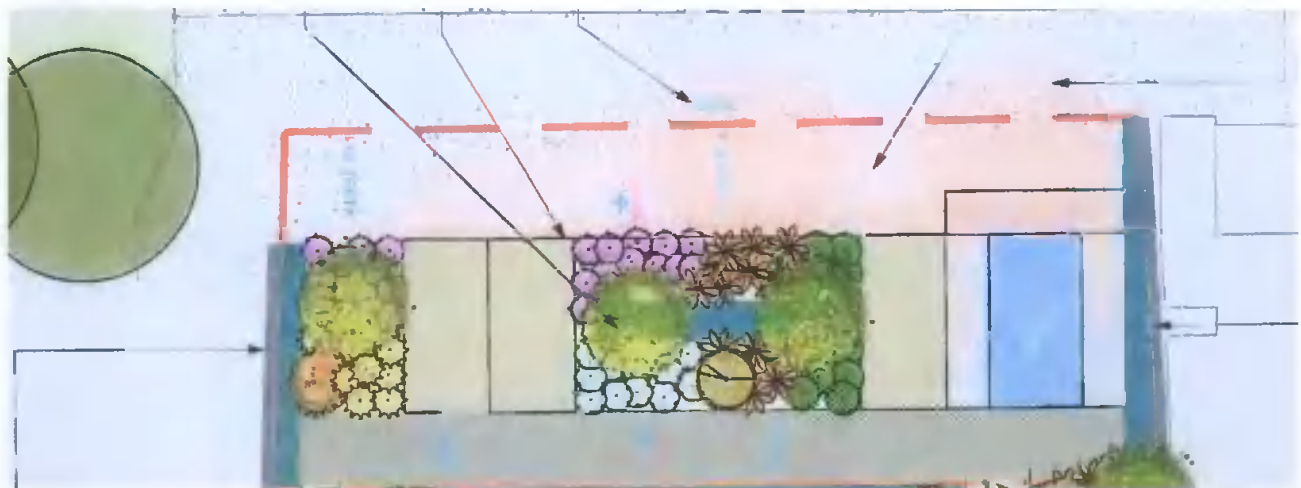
Landscaping plan showing 4 parking spaces rather than 6 and a footpath
